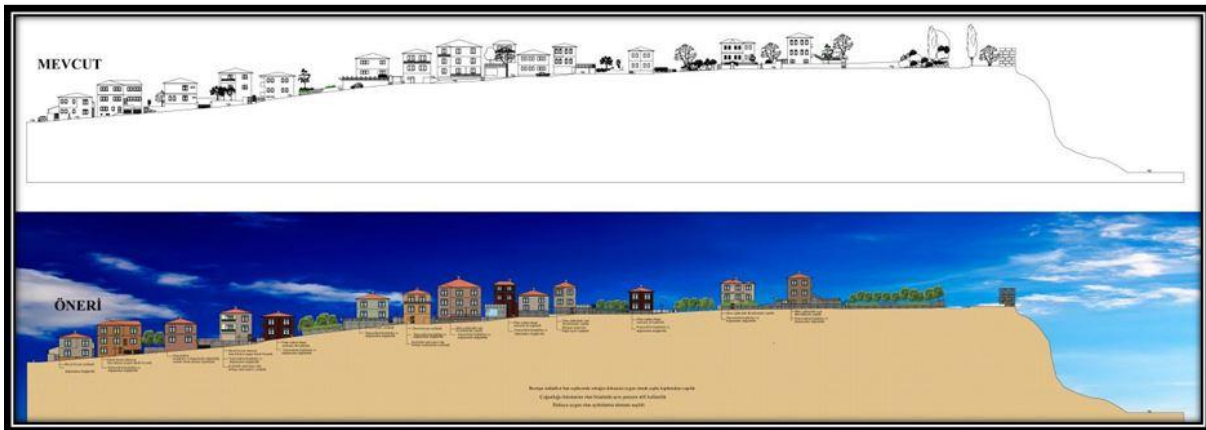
Actual and Proposal Western Silhouettes of Nöbethane Street
